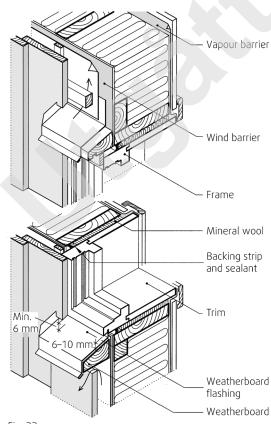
a Window installed in a wall with vertical timber cladding on battens. The window can be positioned further out in the wall so that the outer boards of the wall form the uprights of the exterior casing.
